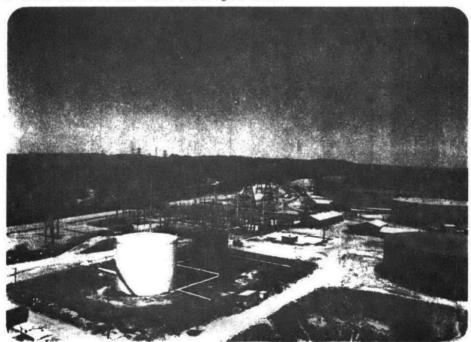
View from the roof of Boiler 5 facing northwest showing oil storage facilities and electrical substation.
